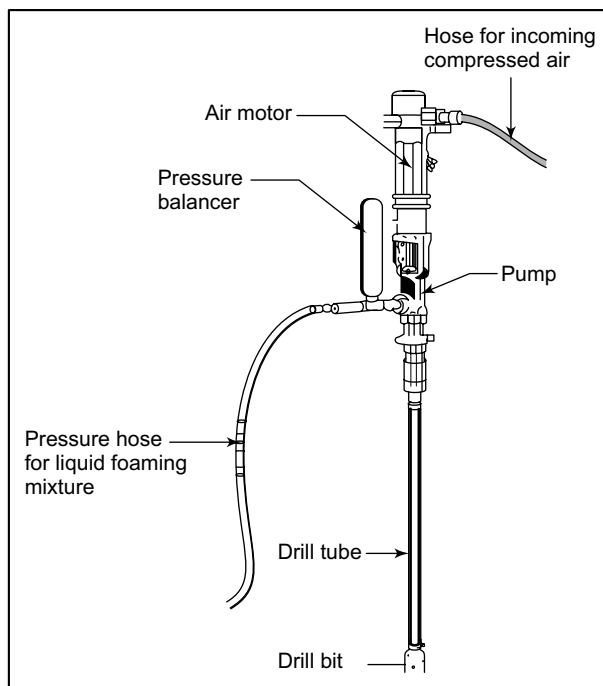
Feed motor of hammer drill equipped with foam flushing unit
